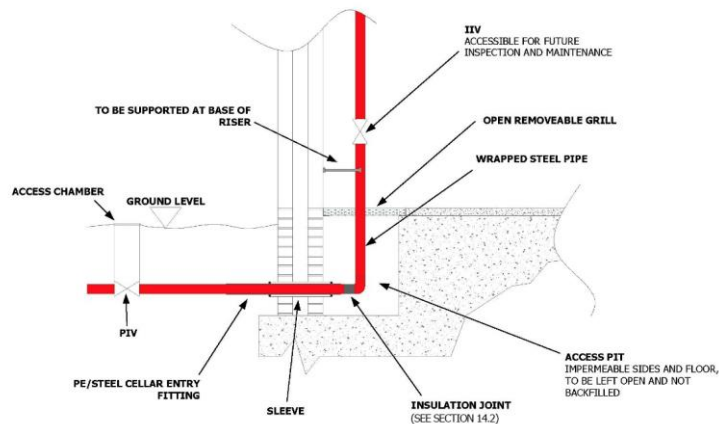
TYPICAL BELOW-GROUND ENTRY. STEEL PIPE IN A SLEEVE
